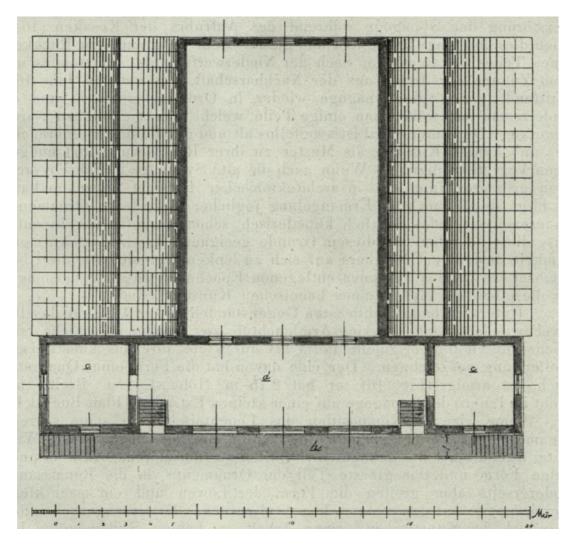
First floor plan of the synagogue in Pohrebyshche (Key to plan figs 13, 14. a. Men's section, b. Women's section, c. Anteroom, d. Hall (Polish), e. Ark (Aron Hakodesh). f. Candelabra (Menorah). g. Altar (*almemor*). h. Stairs with balacony leading to women's section)
